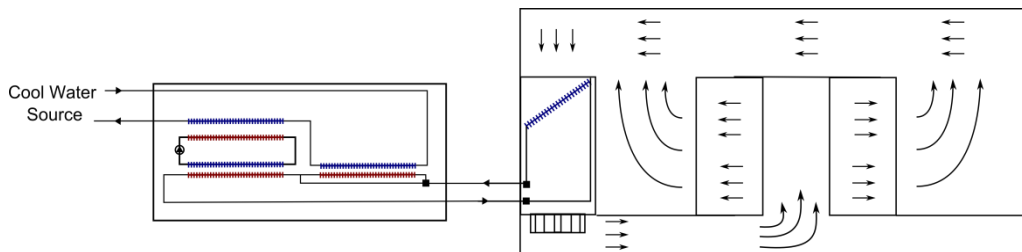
A simple schematic illustrating the operation of a water cooled chiller incorporating a free cooling heat exchanger.
